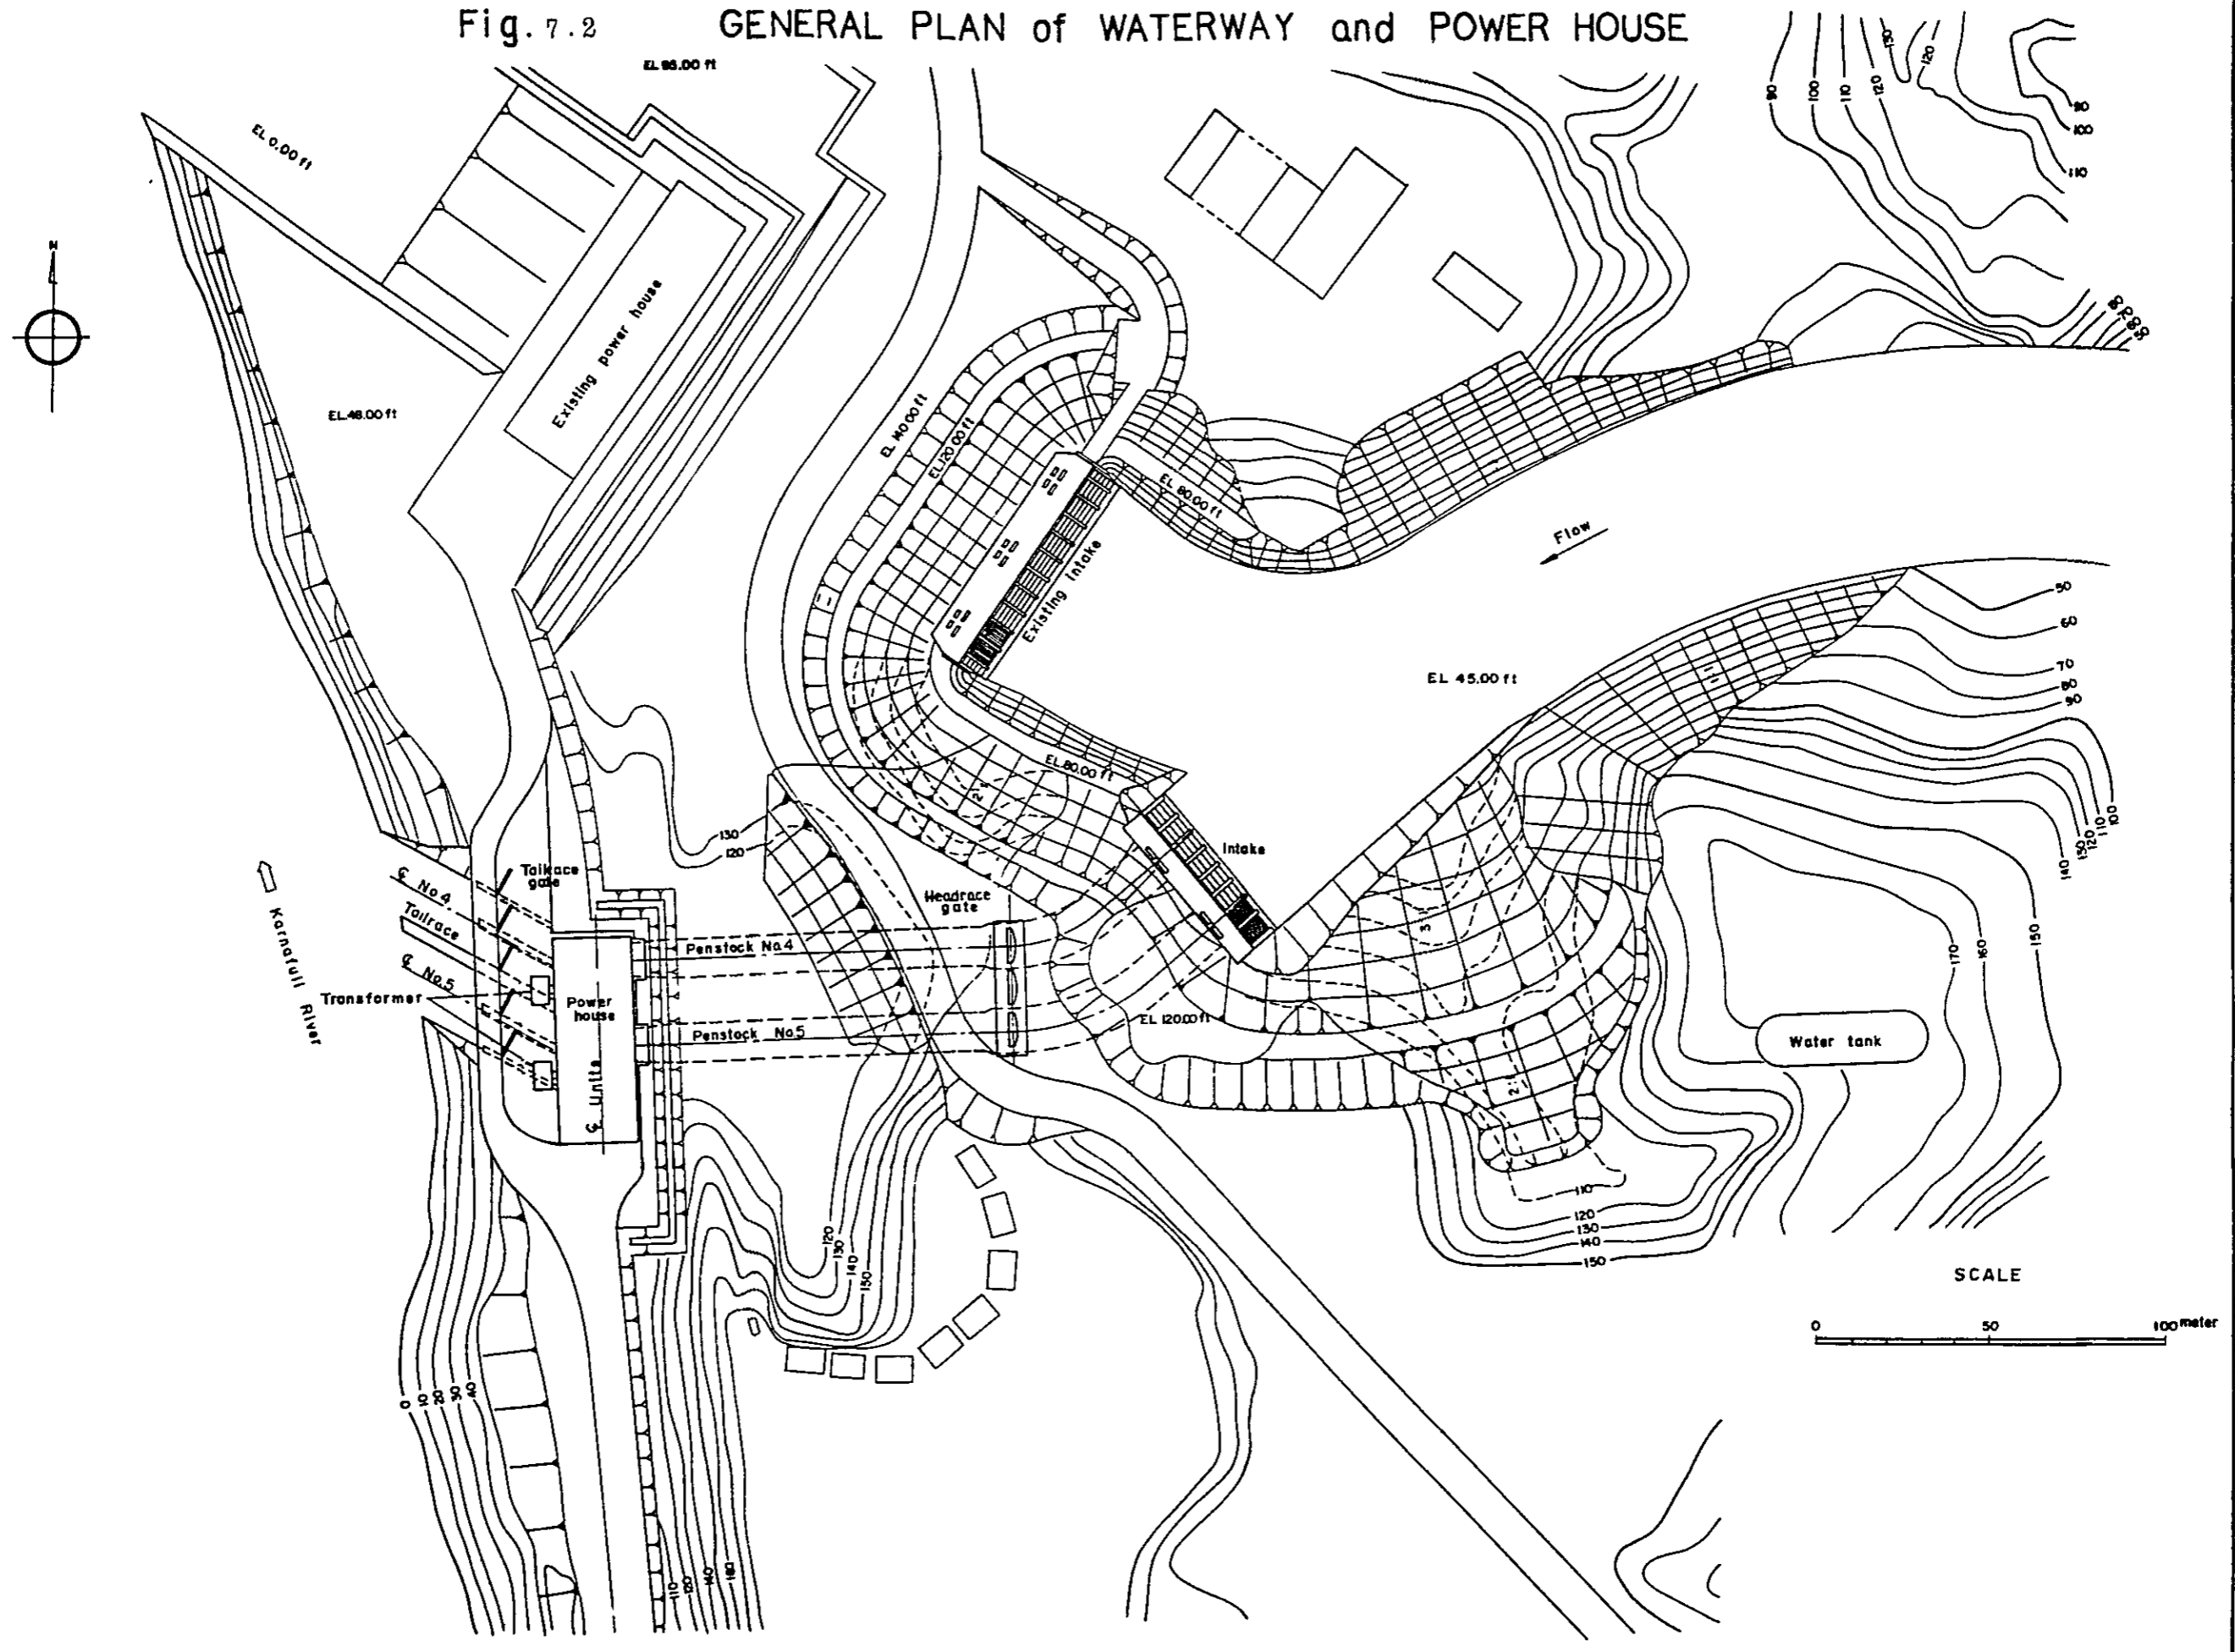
GENERAL PLAN of WATERWAY and POWER HOUSE
